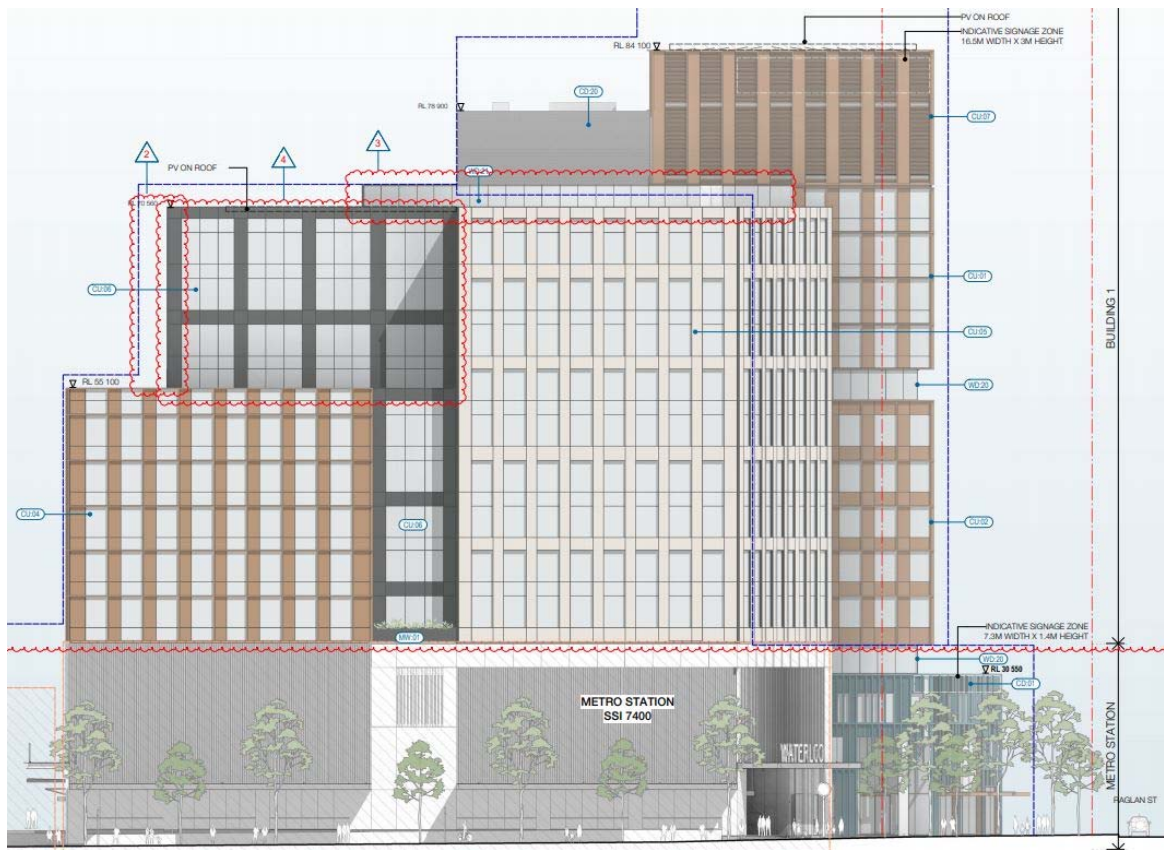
| East Elevation (Cope Street) (source: Applicant's RtS)
